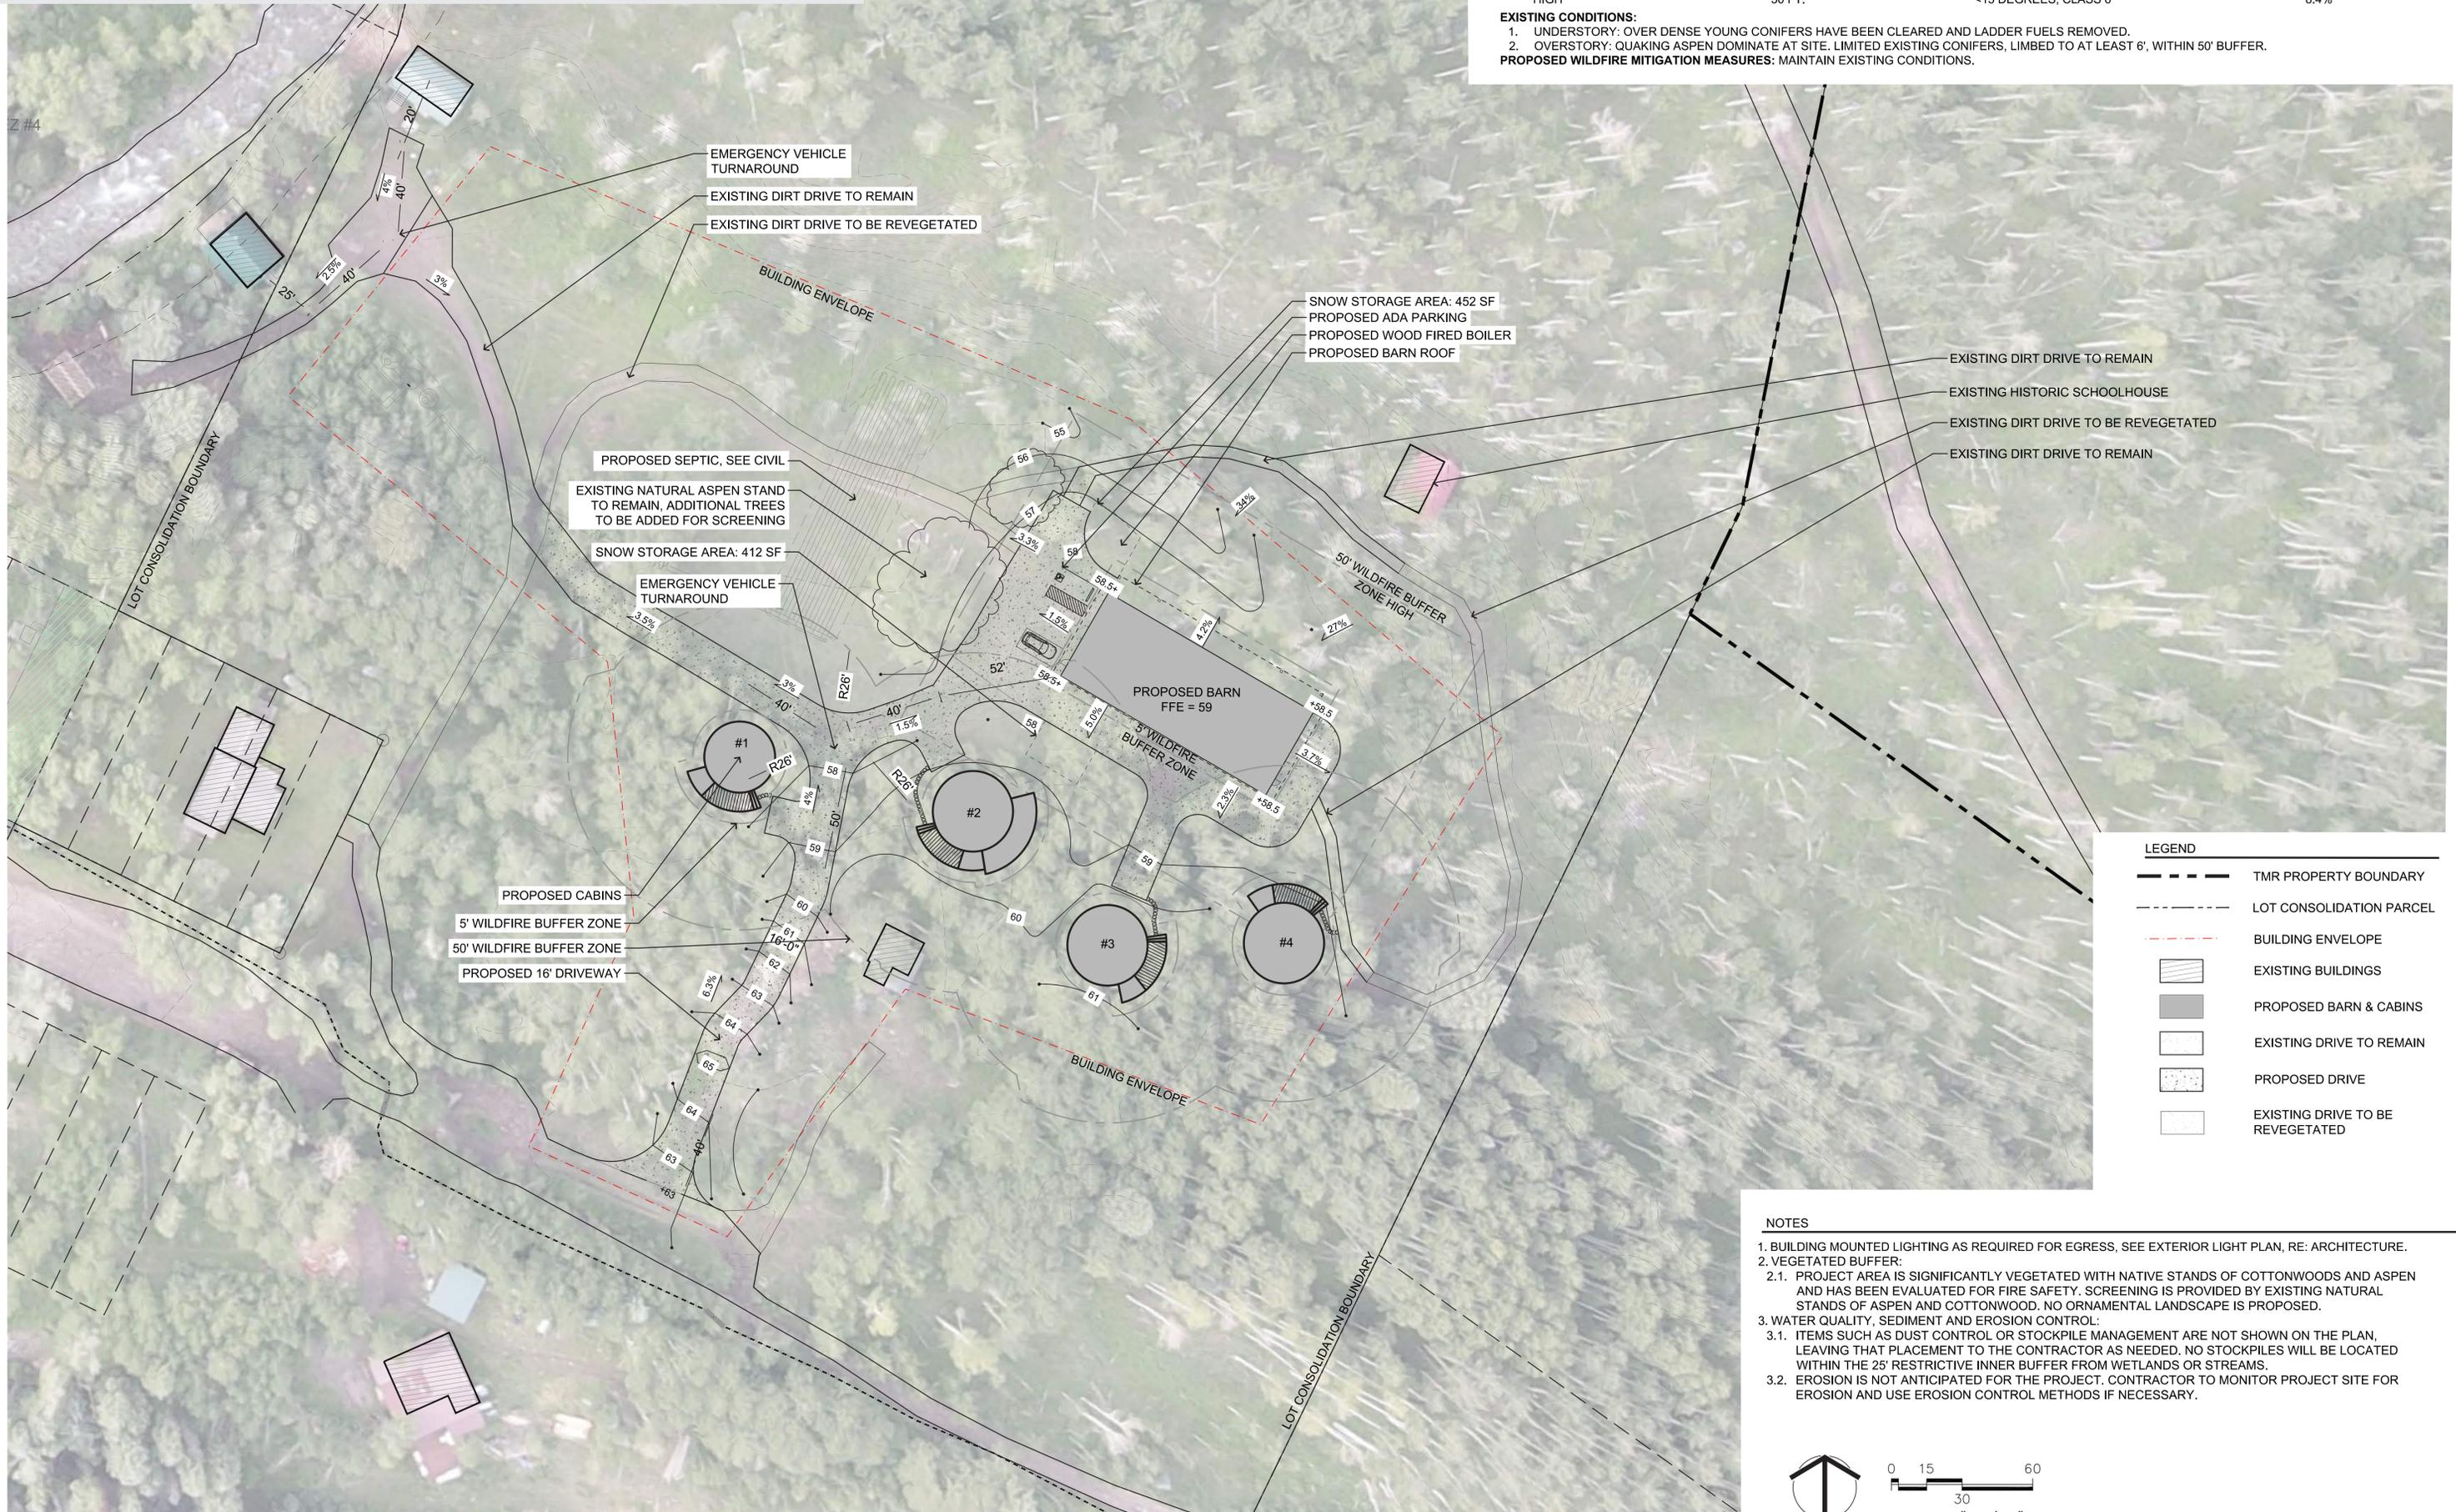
Site Plans - Barn and Cabin Enlargement
